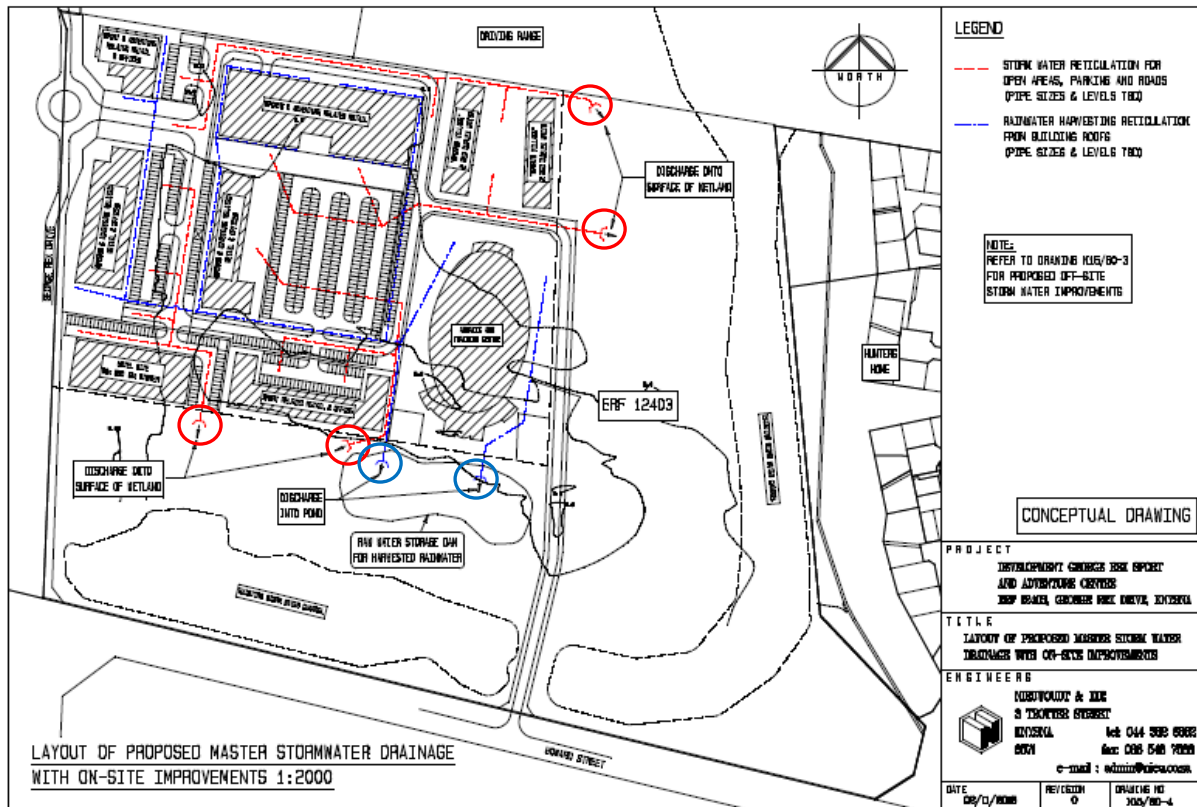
Stormwater drainage plan for Erf 12403 (Niewoudt & Kie, 2018)
